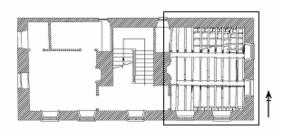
South range: First-floor joists, showing the location of samples YRD-F18–27 (John Allan)
